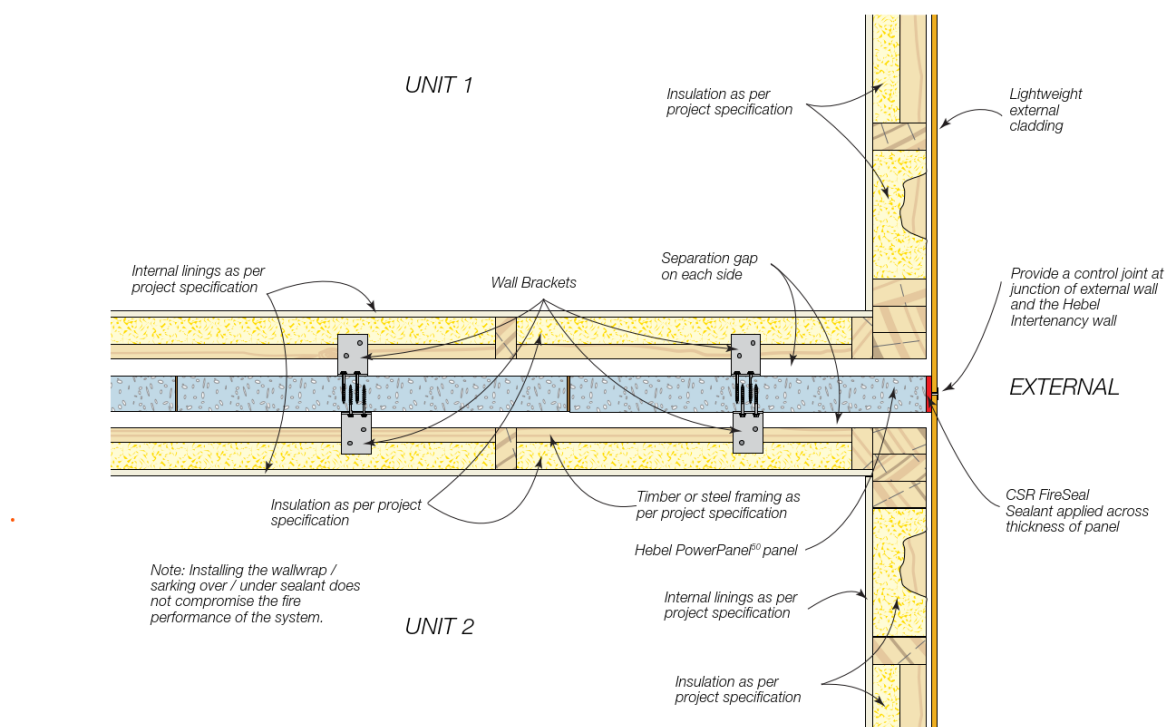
Junction detail of lightweight external cladding (direct fixed to studs) and Hebel partywall – junction width < 10 mm
